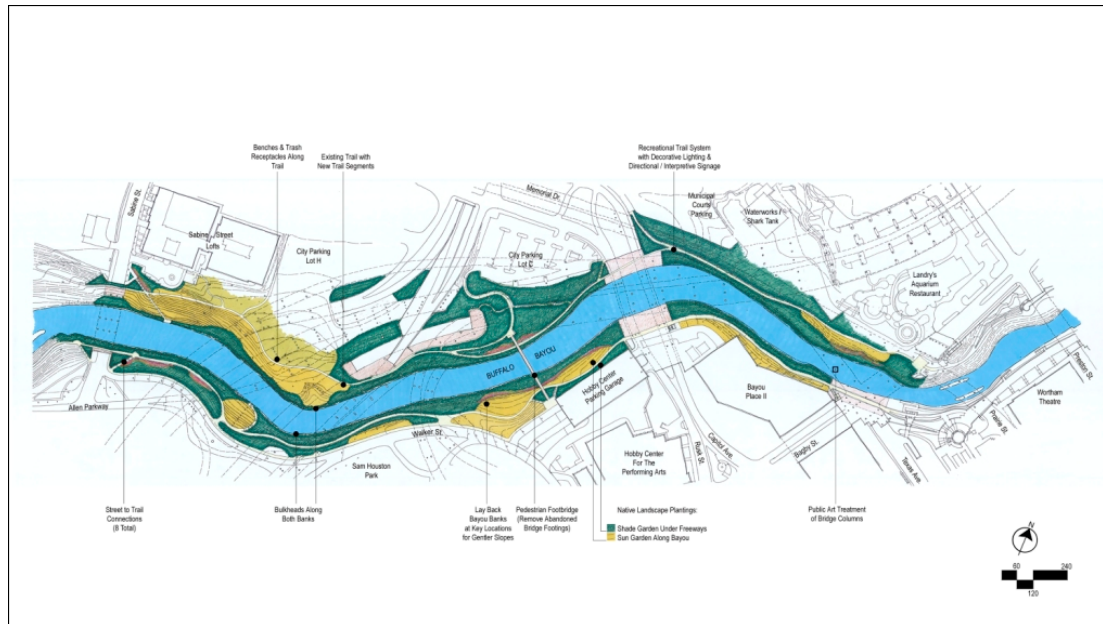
Master Plan of Buffalo Bayou Promenade. (Image resource: <http://www.asla.org/2009awards/104.html>)
